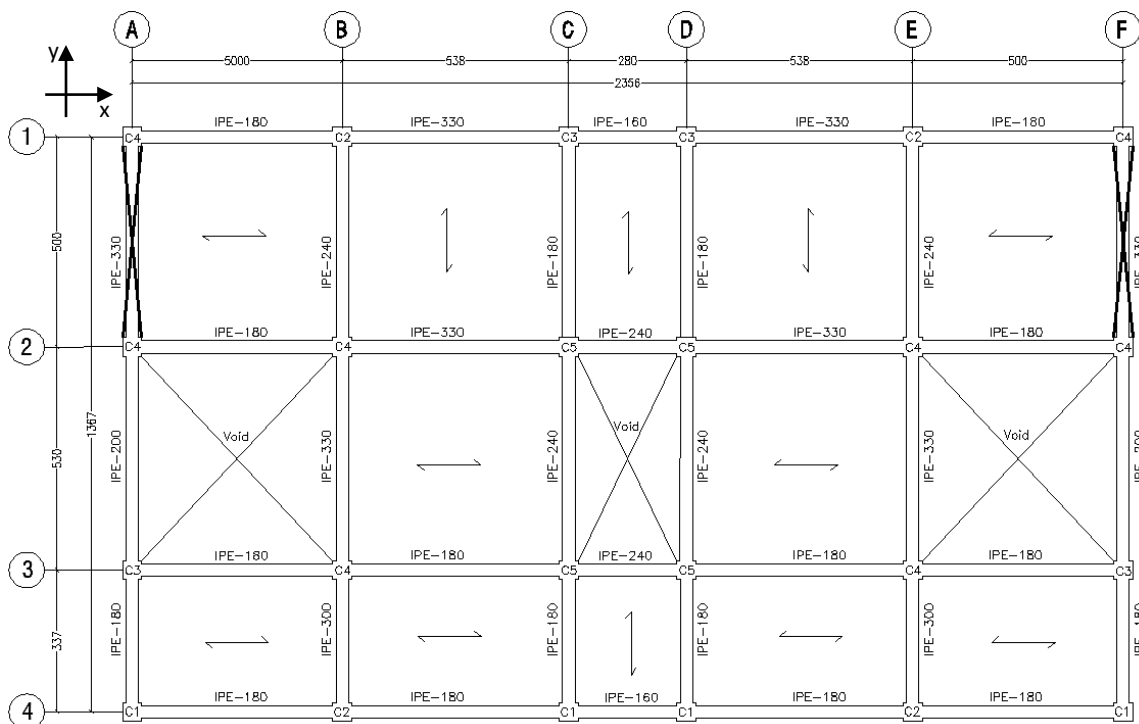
Plan of the 2nd, 3rd and 4th floors of index building (units in centimetre)
